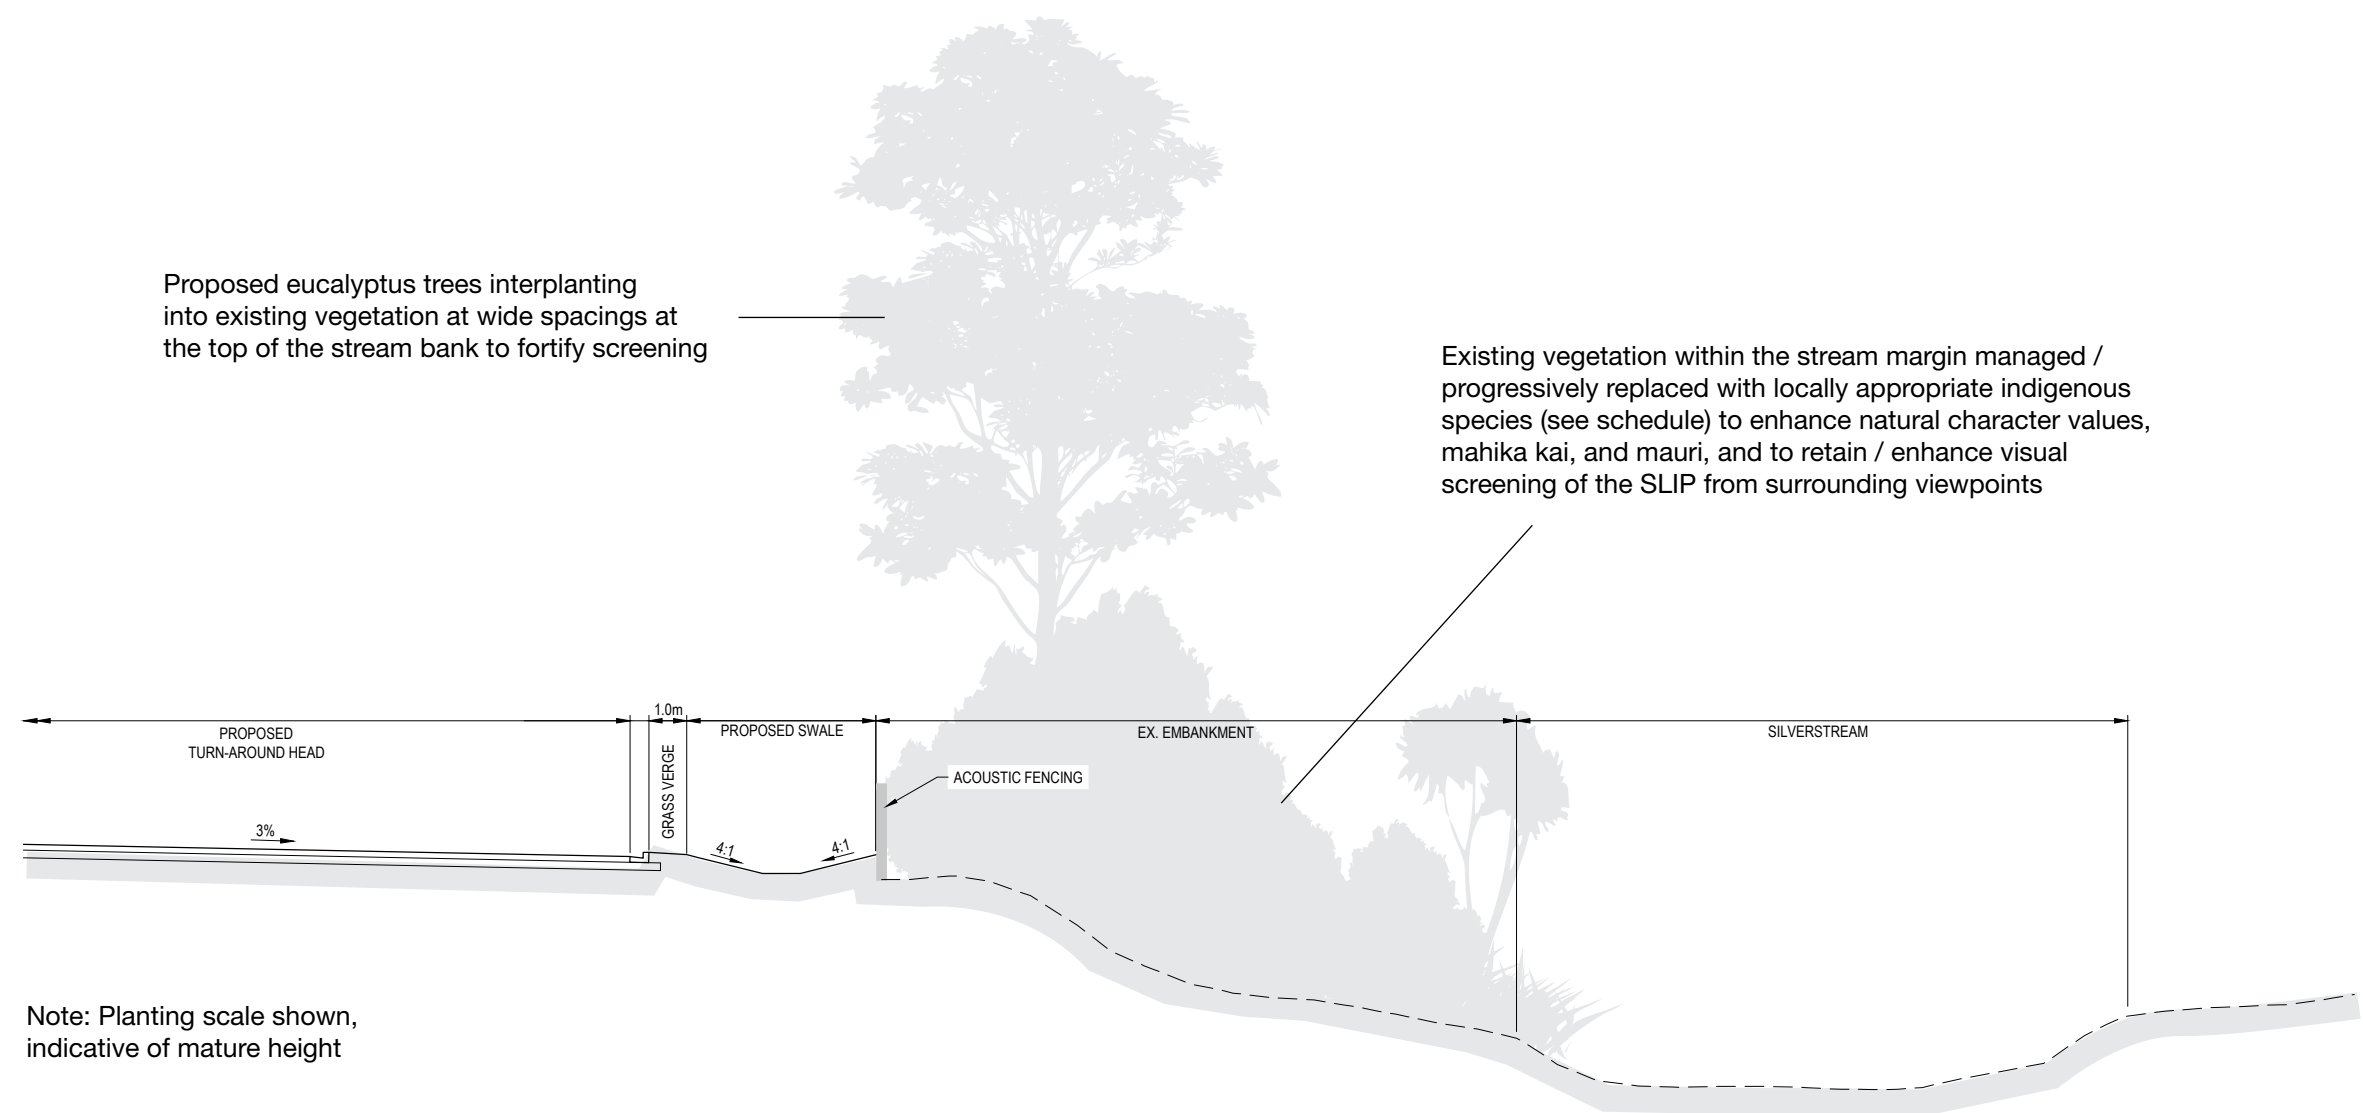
Indicative Cross Sections – Mitigation Planting.
